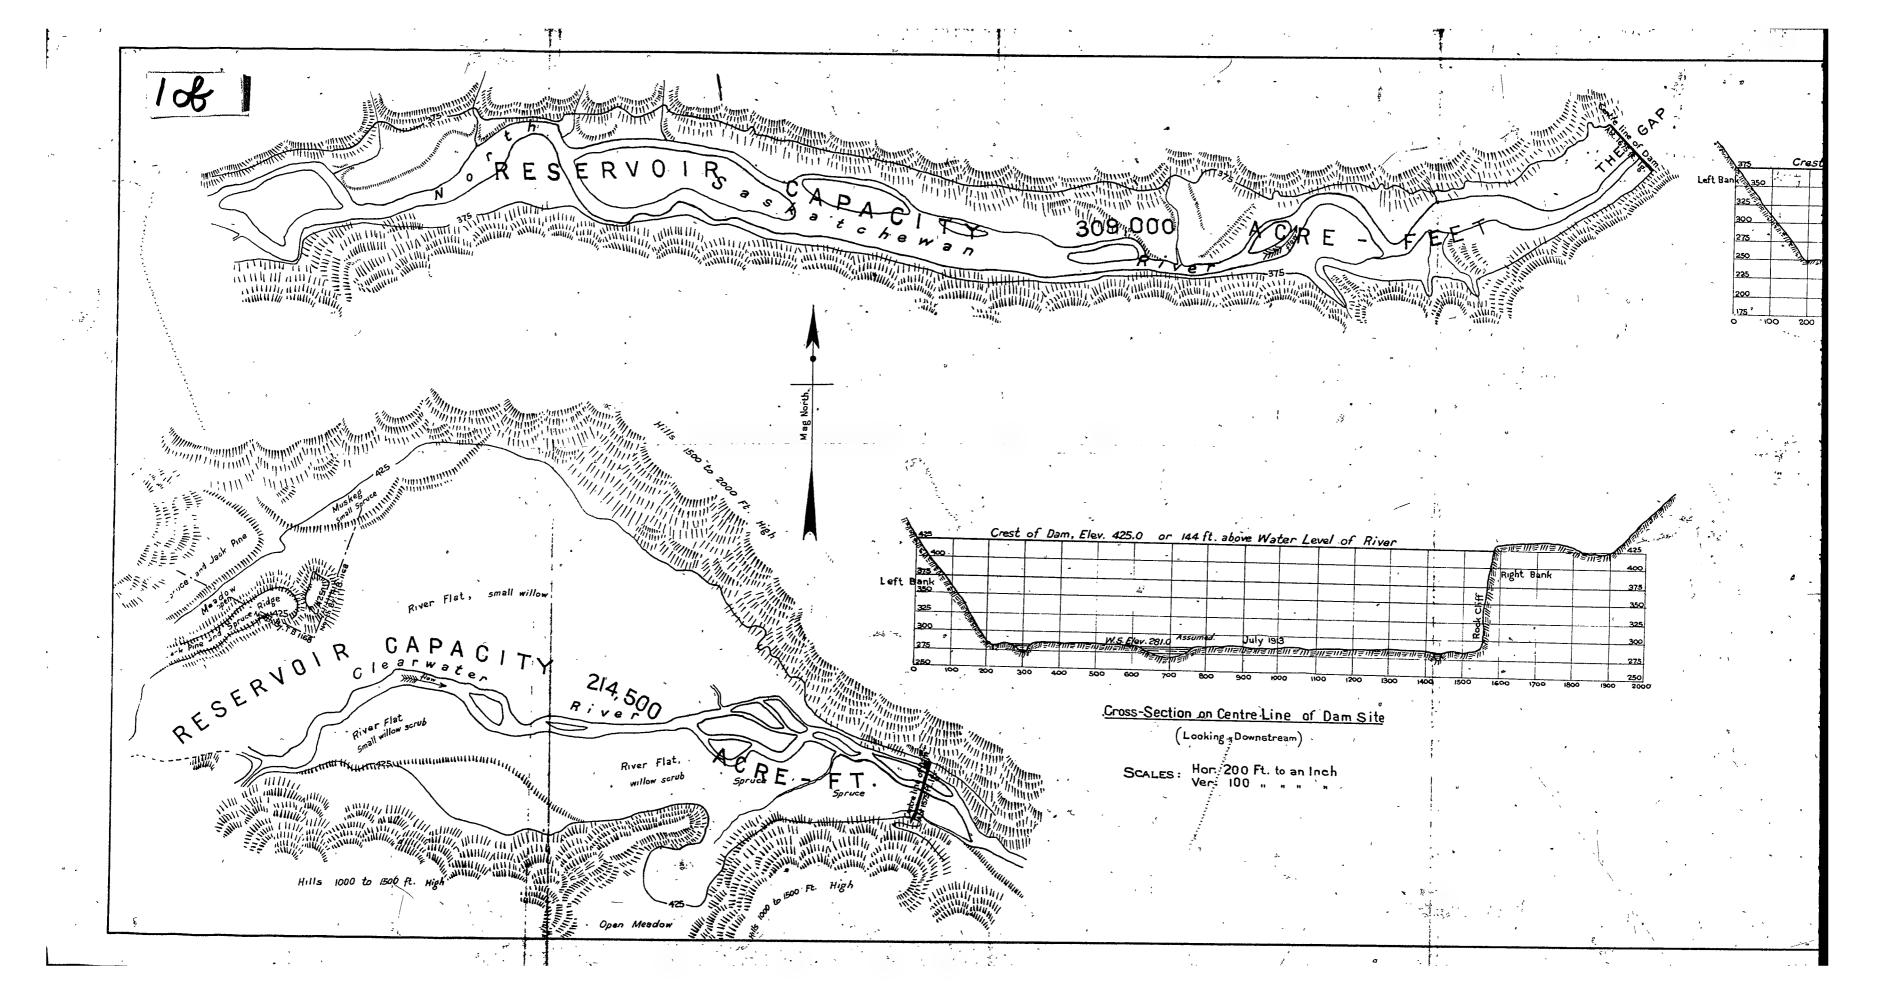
PLATE G-I Cross-Section on Centre Line of Dam Site (Looking Downstream) Scales: Hor 200 Ft to an Inch Grest of Dam, Elev. 425.0 · or 144 ft. above Water Level of River Public Works , Canada NORTH SASKATCHEWAN RIVER SURVEY Showing location of proposed
